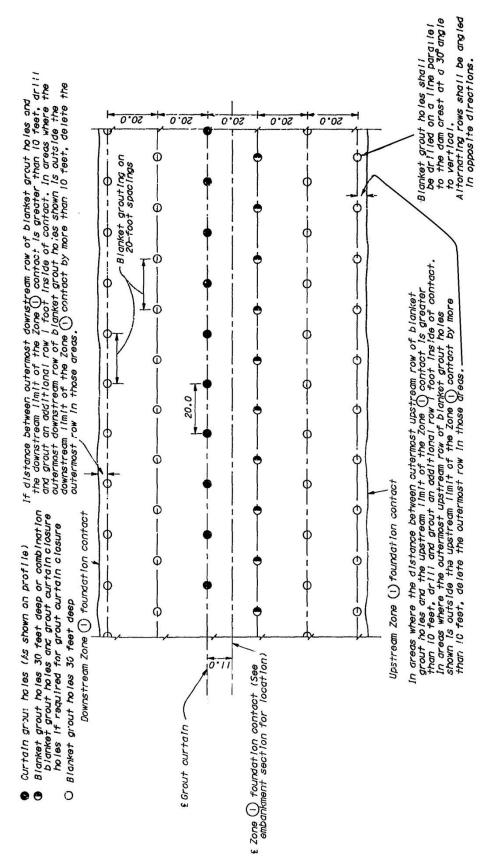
Section view of original grout curtain design at Jordanelle Dam – Stage 2 (1 of 2)
